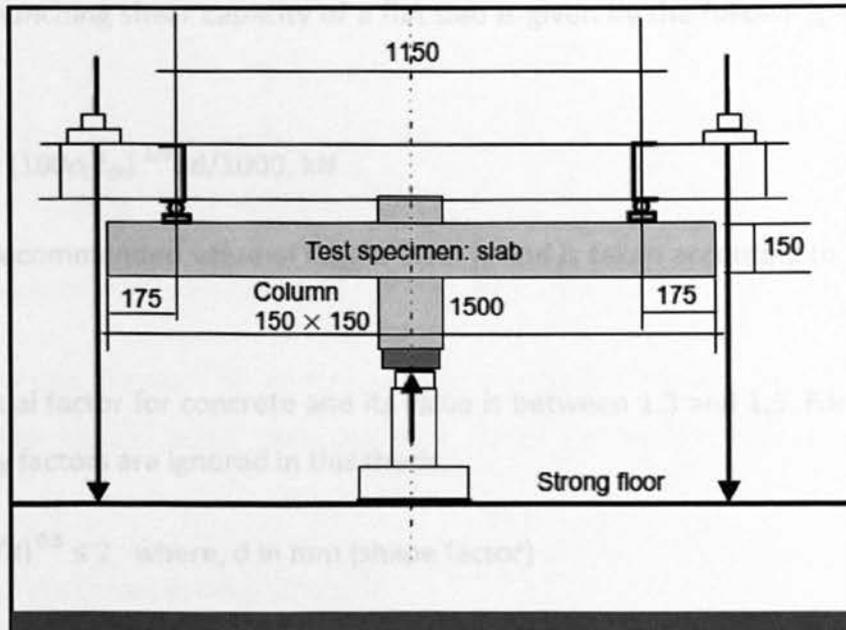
Flat slab Test Arrangement (Subedi and Baglin 2002)
